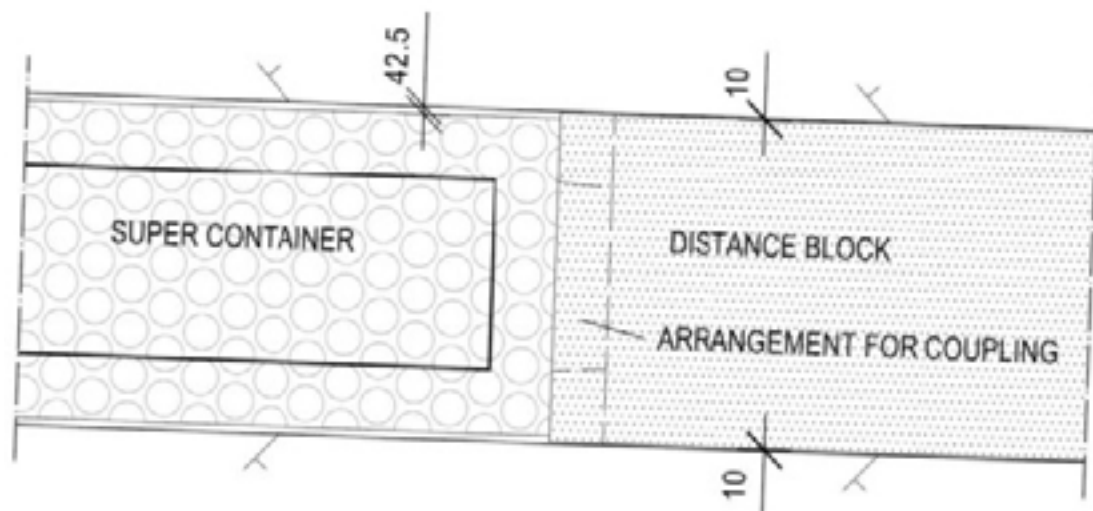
The coupling between distance block (the gap between rock and block has not been fixed, here it has been assumed to be 10 mm) and supercontainer can be arranged in several ways all having the same objective to minimize the gap in order to prevent exposure to full hydrostatic pressure on whole surface area.
